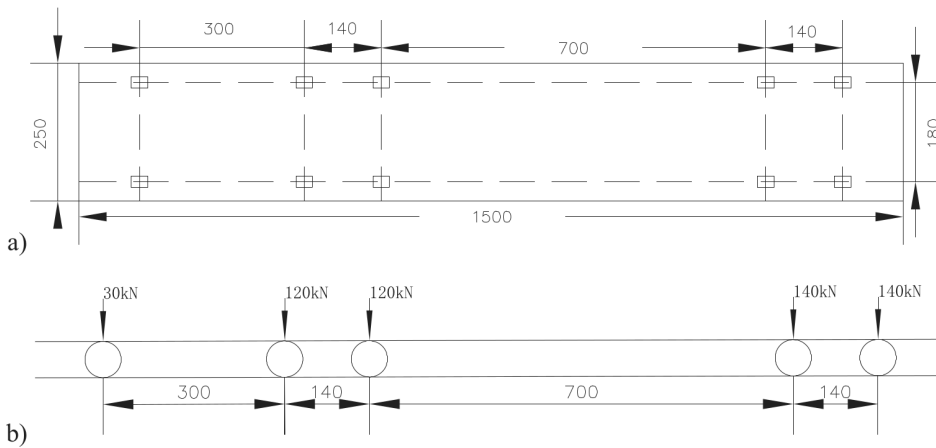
Design load distribution: a) plane size, b) elevation size (cm)
